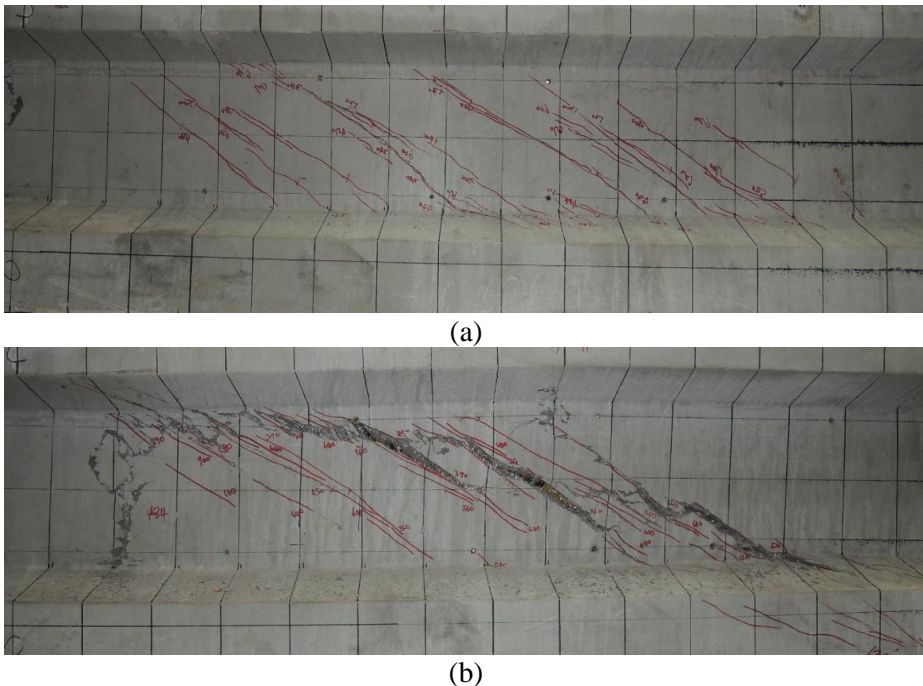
Cracking behavior in web of UHPFRC I-shaped beam without stirrup: (a) microcracks in web and (b) major cracks at failure
